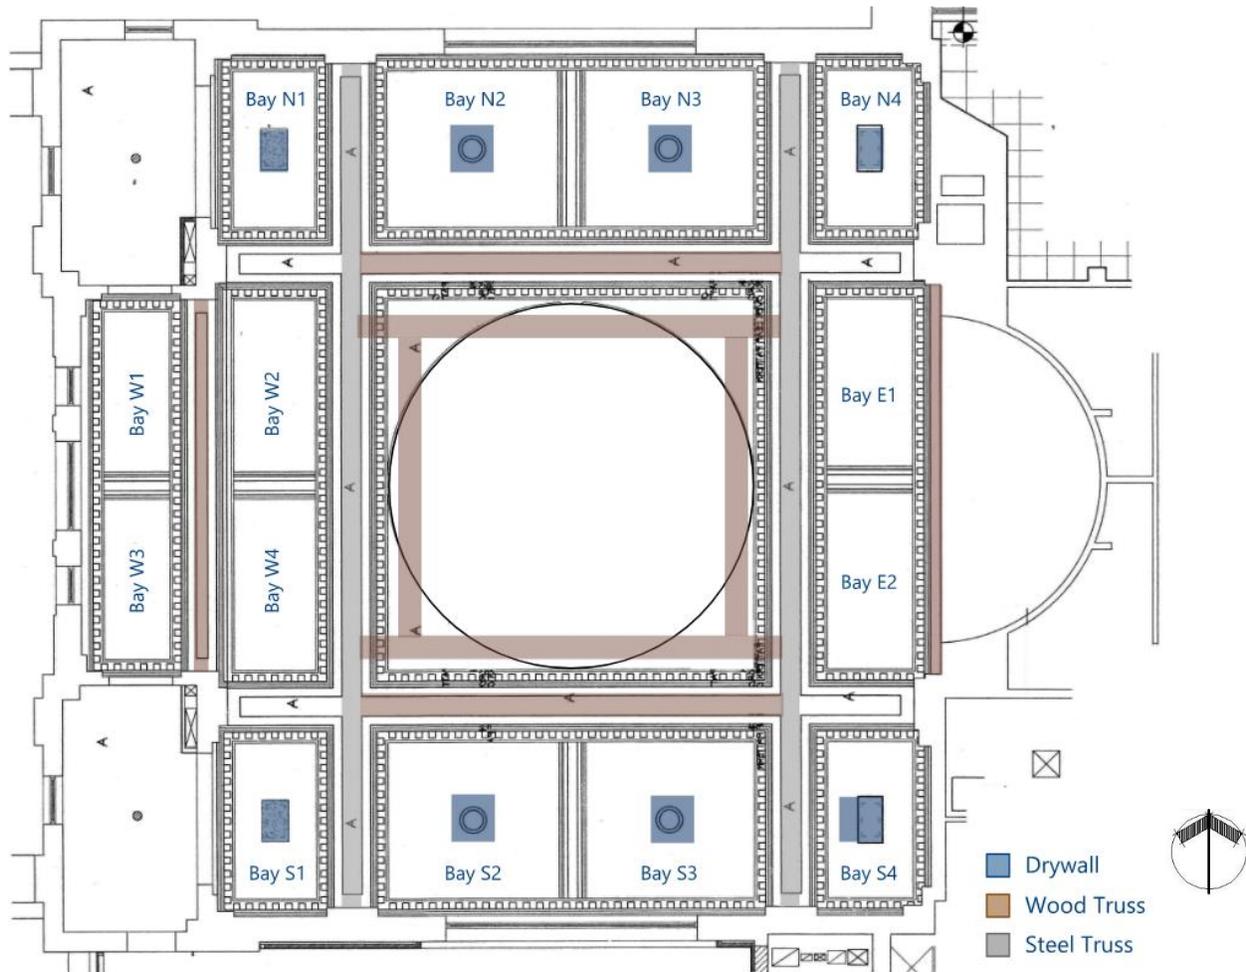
Reflected sanctuary ceiling plan showing locations of trusses and drywall observed from the attic level. (Drawing excerpt provided by St. Nicholas Greek Orthodox Cathedral).
